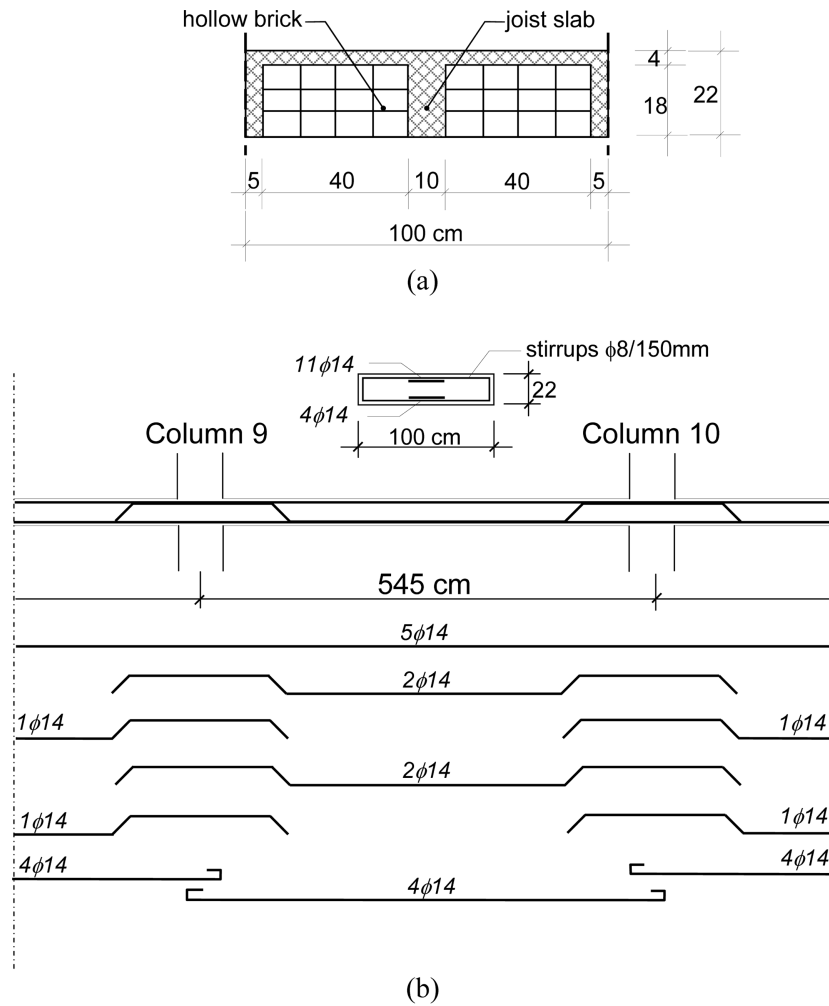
(a) Section of the slab, (b) longitudinal section of an embedded beam
